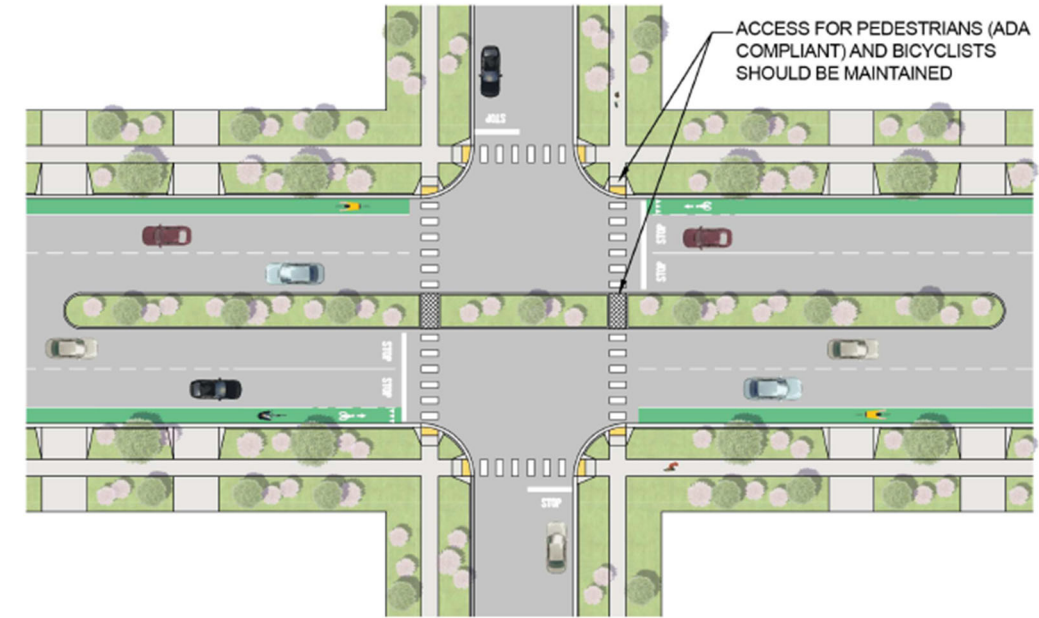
CHANNELIZATION PLAN VIEW
